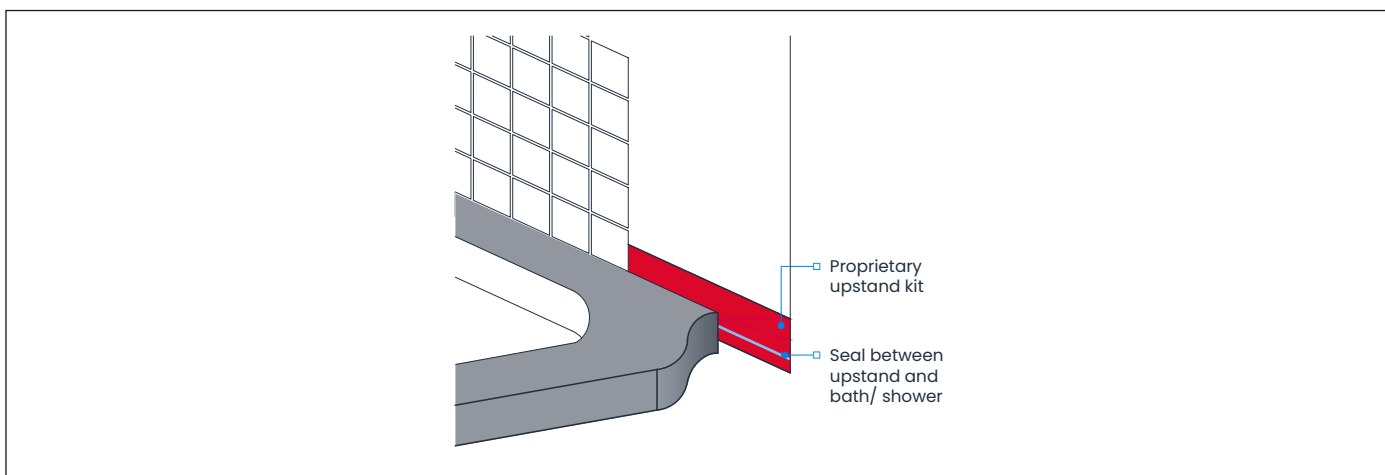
Example of a proprietary flexible upstand kit incorporated behind tiling
